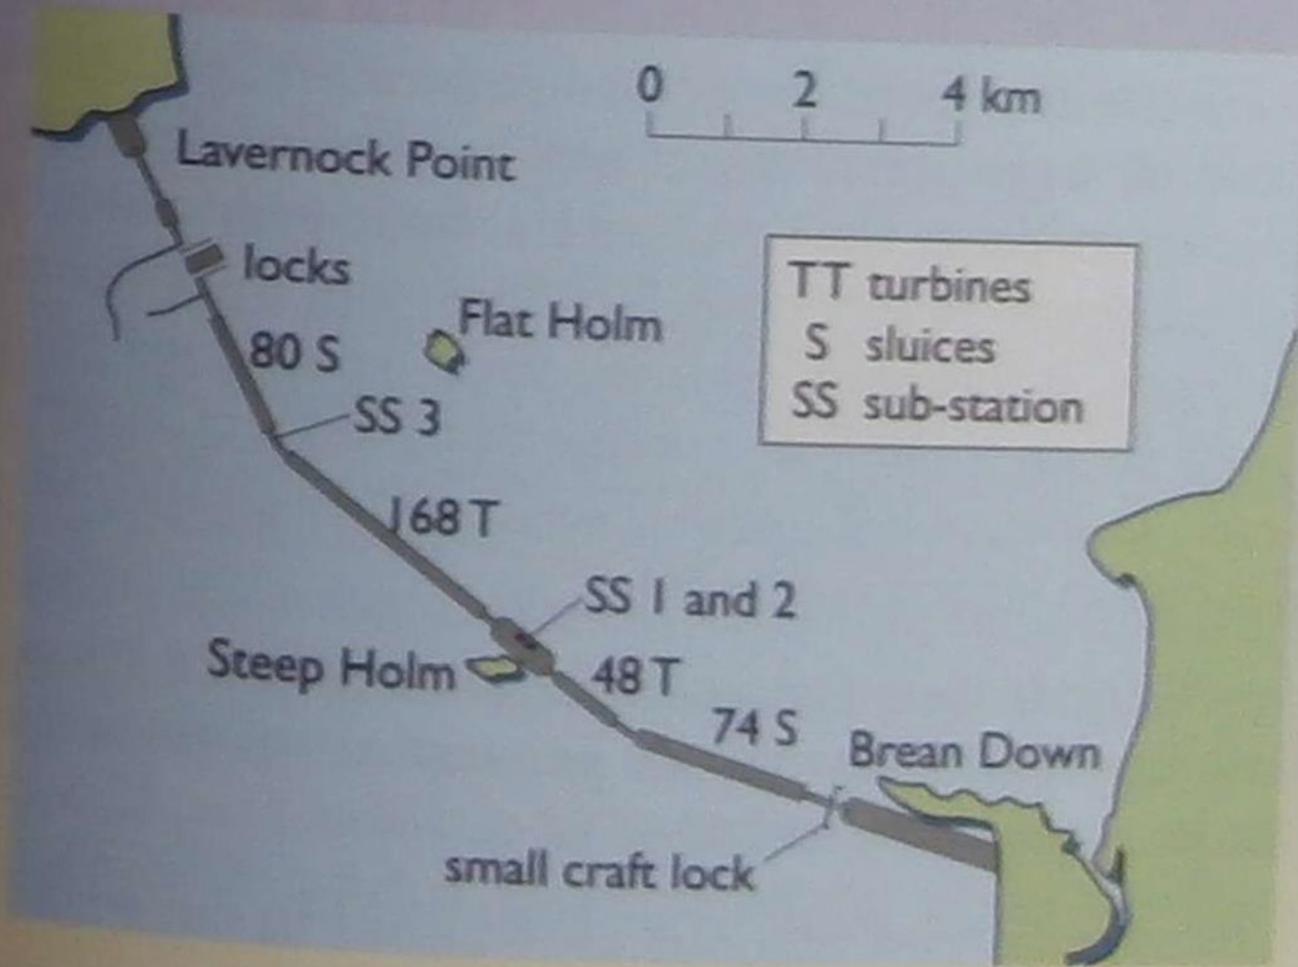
Layout of the proposed Cardiff to Weston Severn Barrage (source: adapted from Department of Energy, 1989)
